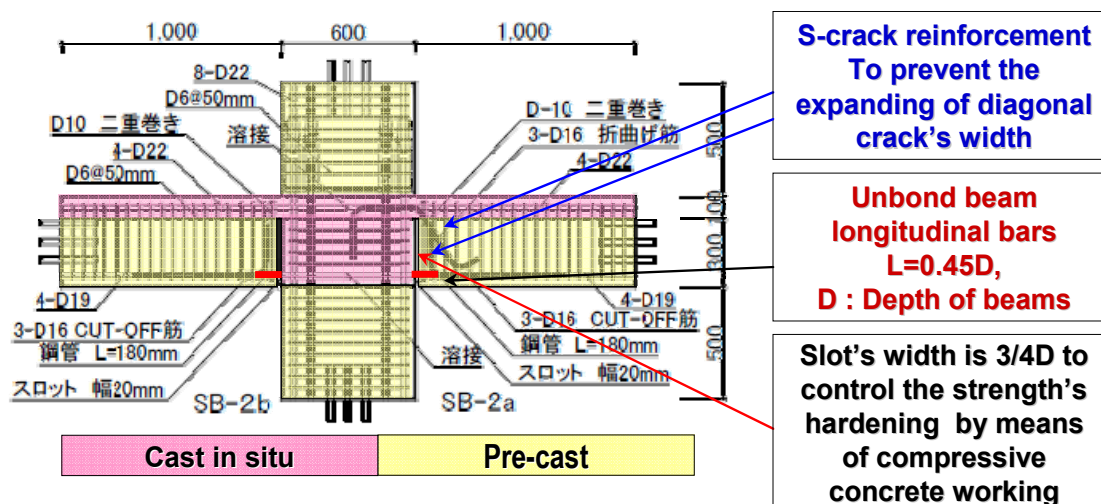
Slotted Articulated floor connection proposed in Japan. [2.34]
